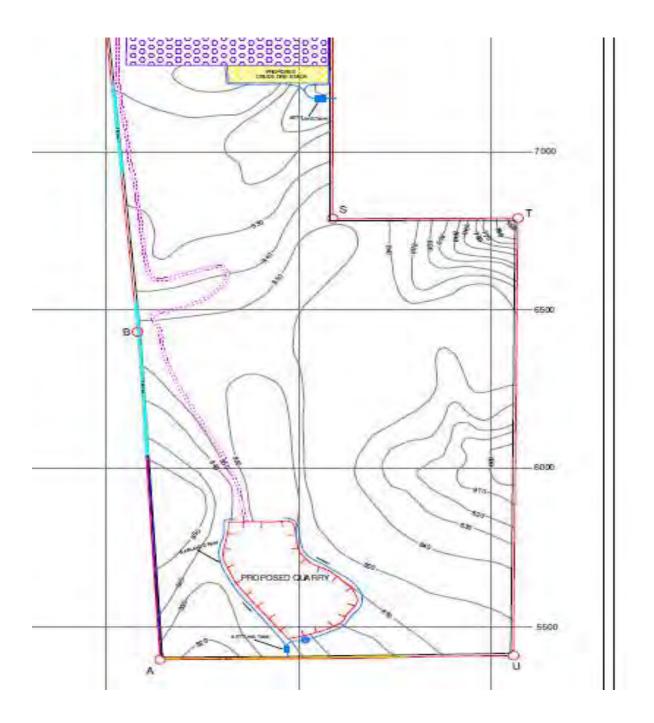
MINE DEVELOPMENT PLAN OF KRIYAKUDAR BLOCK
